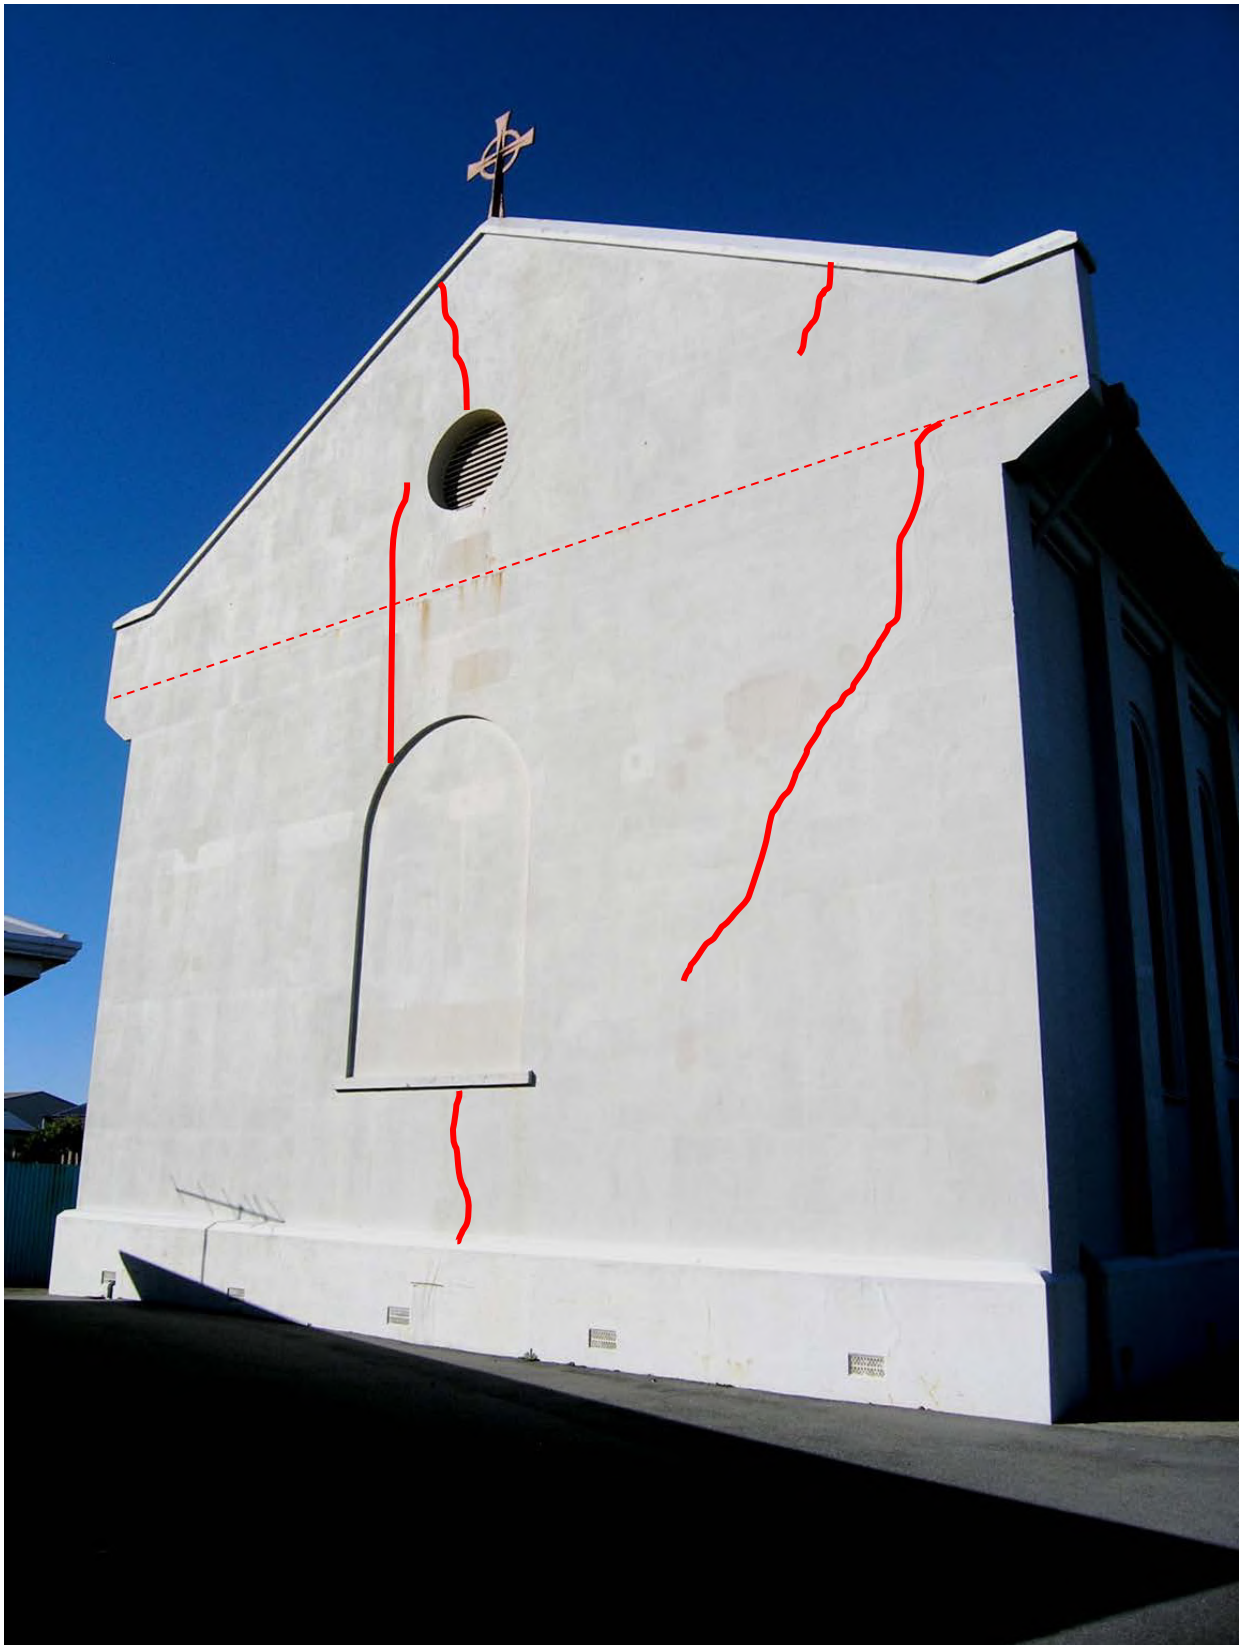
Showing cracking pattern on the west gable. The dashed red line highlights the line of the existing concrete ring beam
